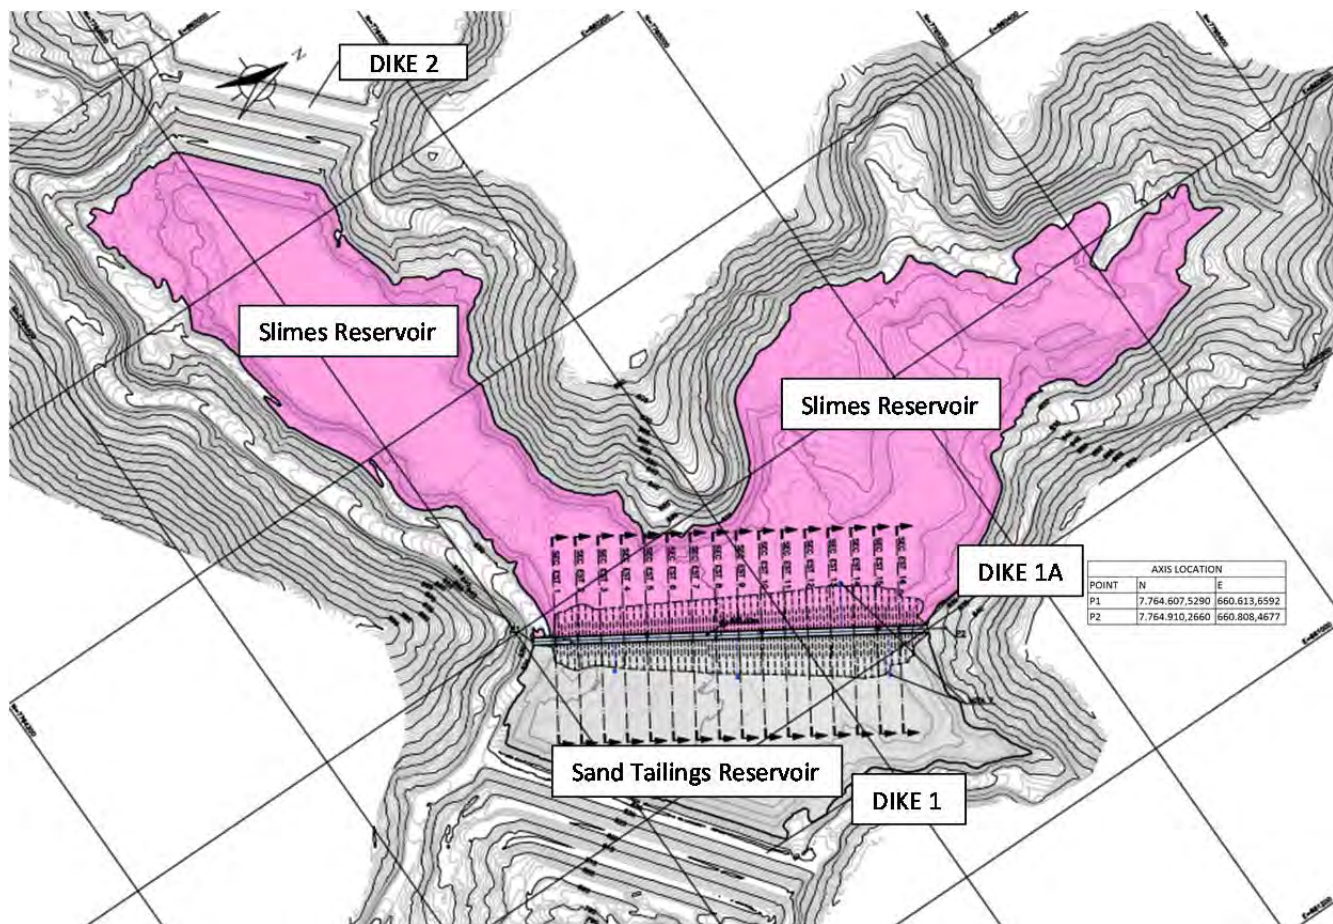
Pimenta de Ávila design drawing^[3] for Old Dike 1A
